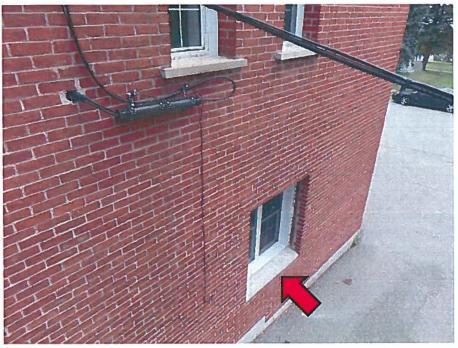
Southwest corner of the newer masonry veneer. Note window sill without drip edge.
